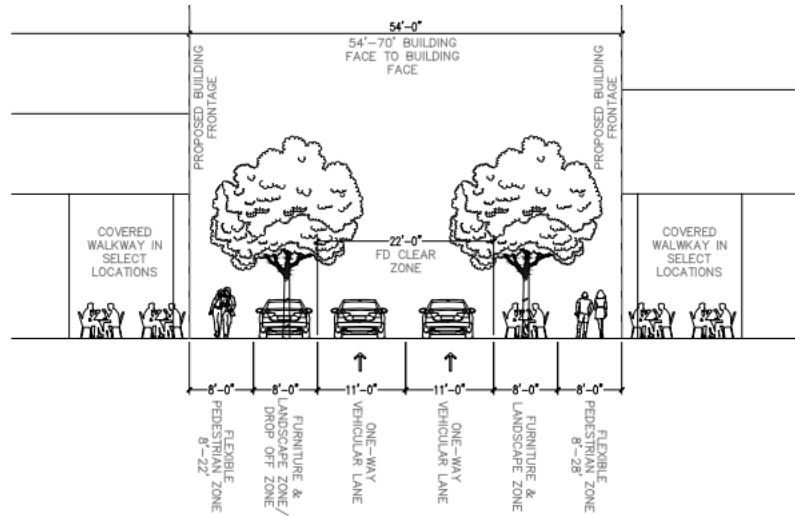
Proposed Barton Springs Rd – Congress Ave Road cross-section
